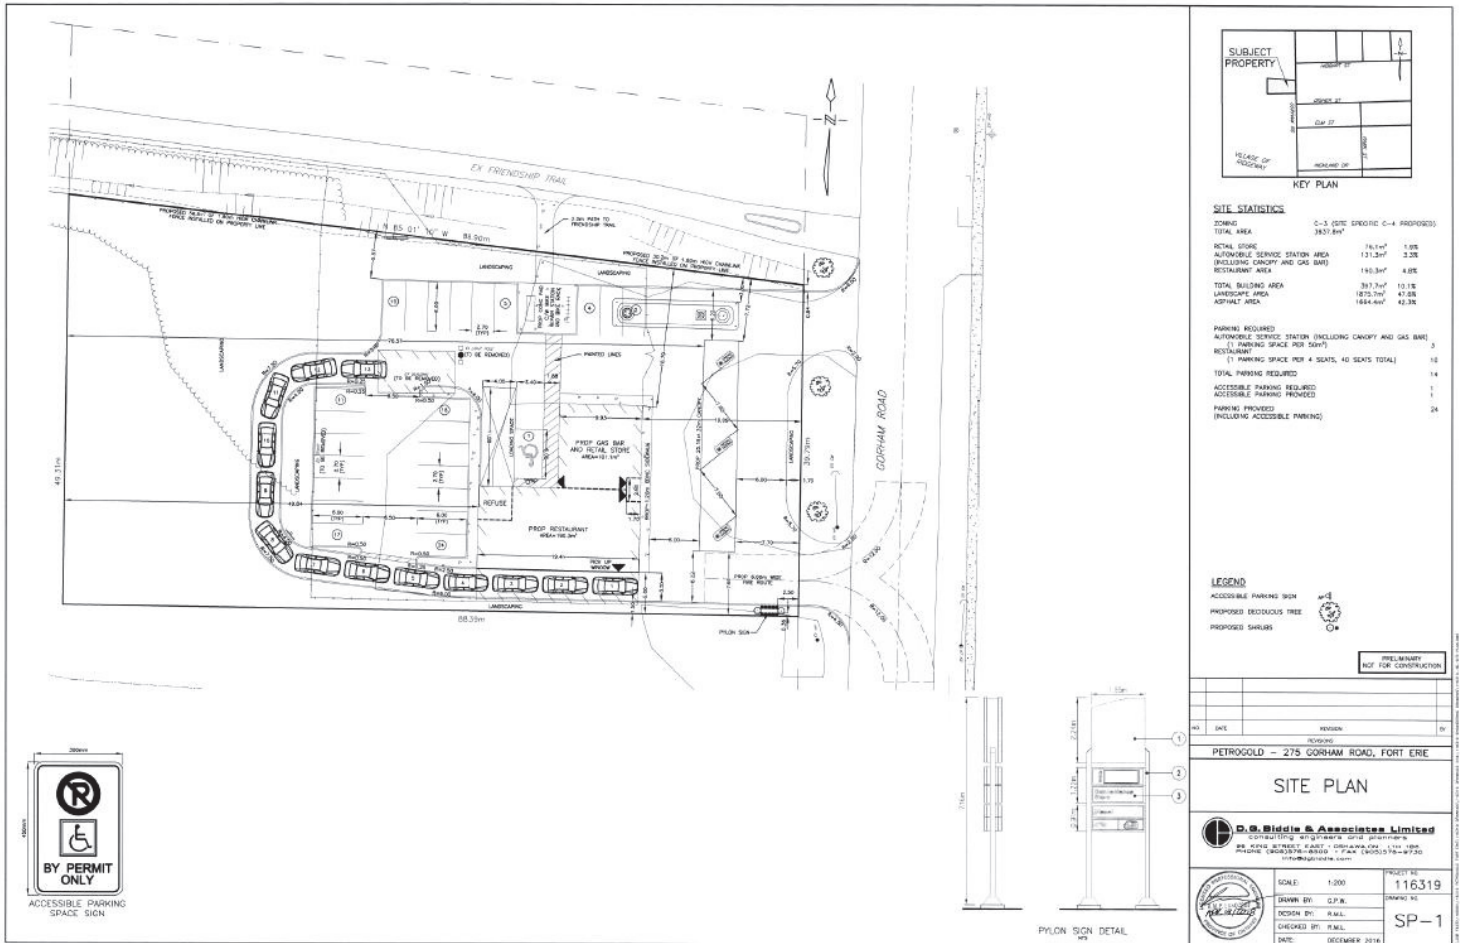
B: PETROGOLD PROPOSED SITE PLAN
